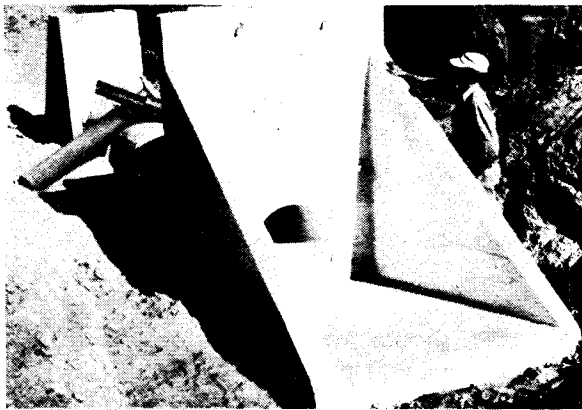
Completed turnout structure ready for backfilling. P 328-701-6580
